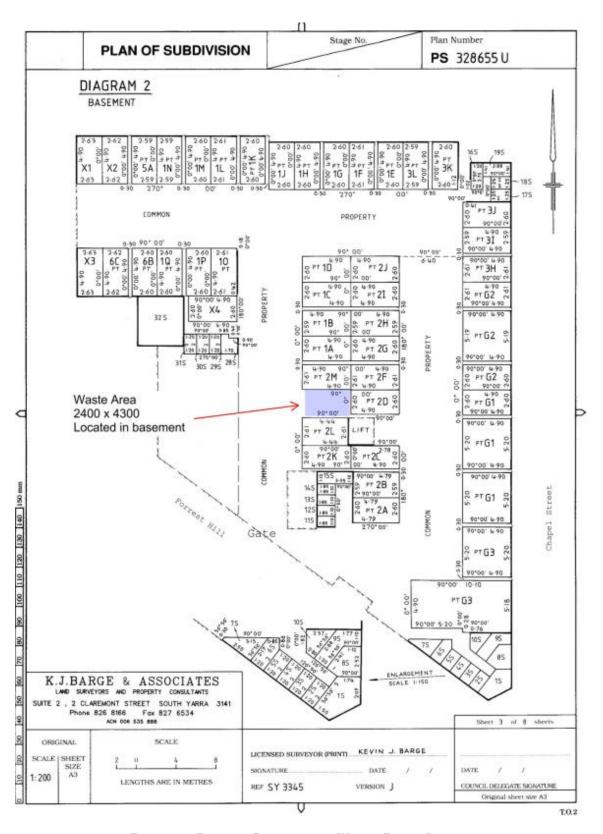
PLAN OF SUBDIVISION WASTE ROOM LOCATION
